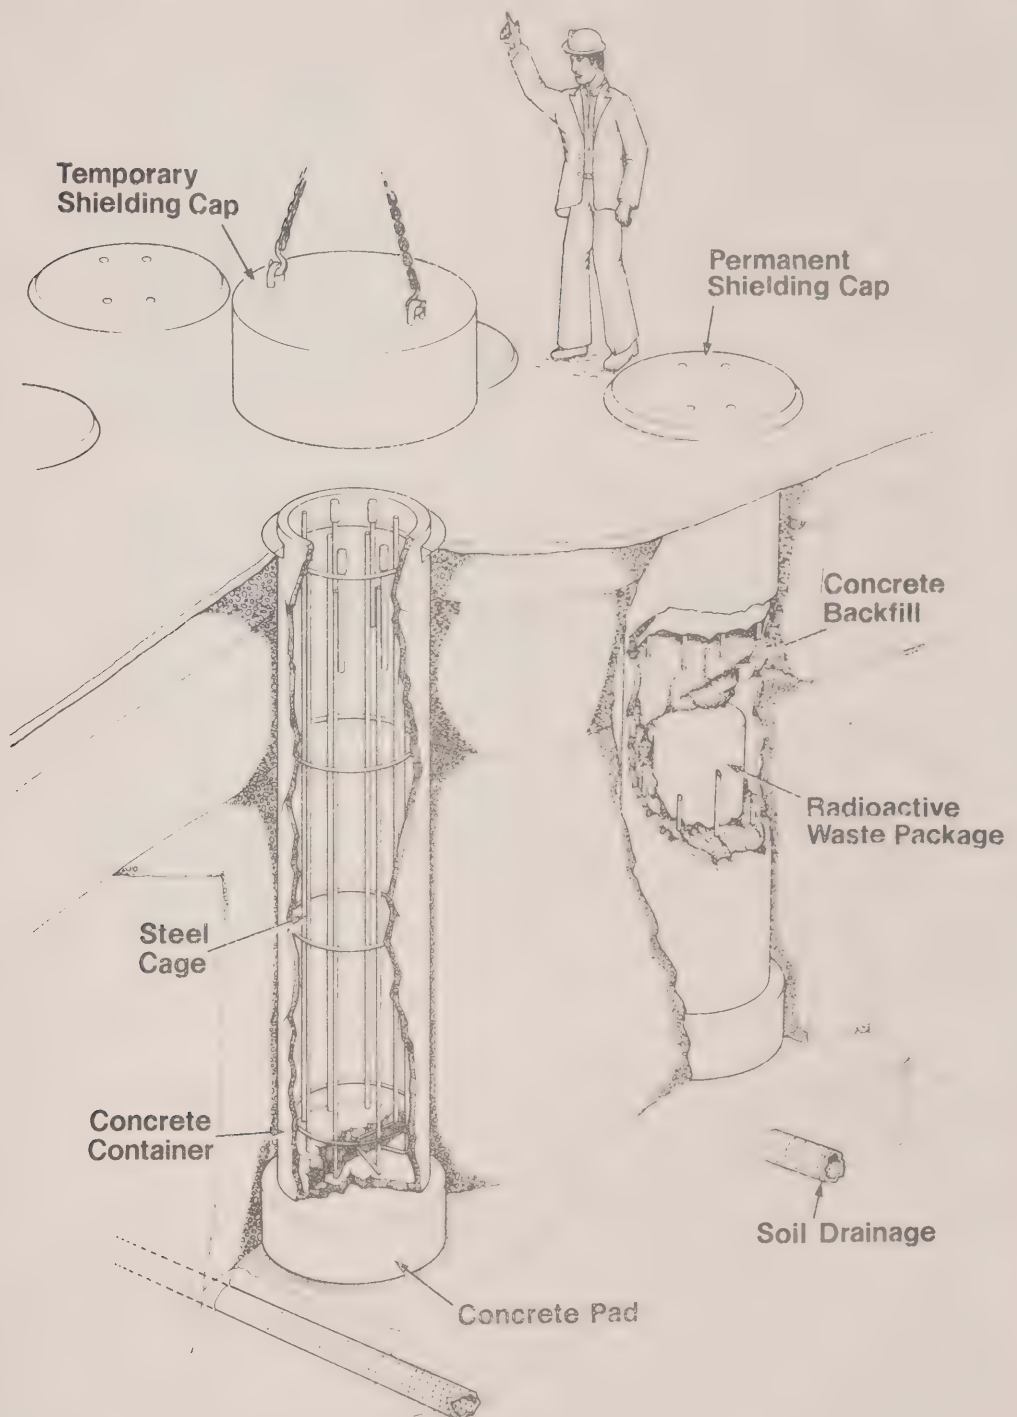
SKETCH OF WASTE STORAGE SITE 2
